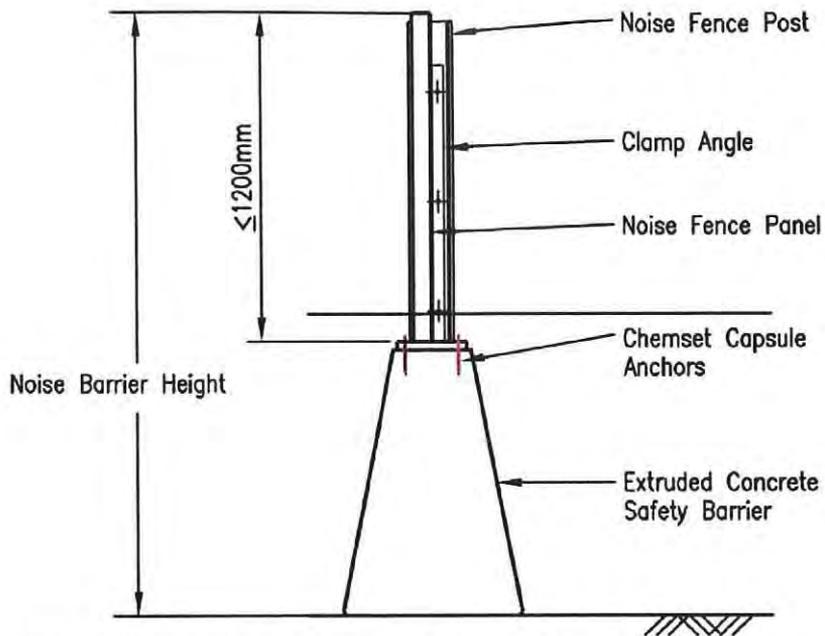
(b) Option B – Extruded Concrete Safety Barrier
